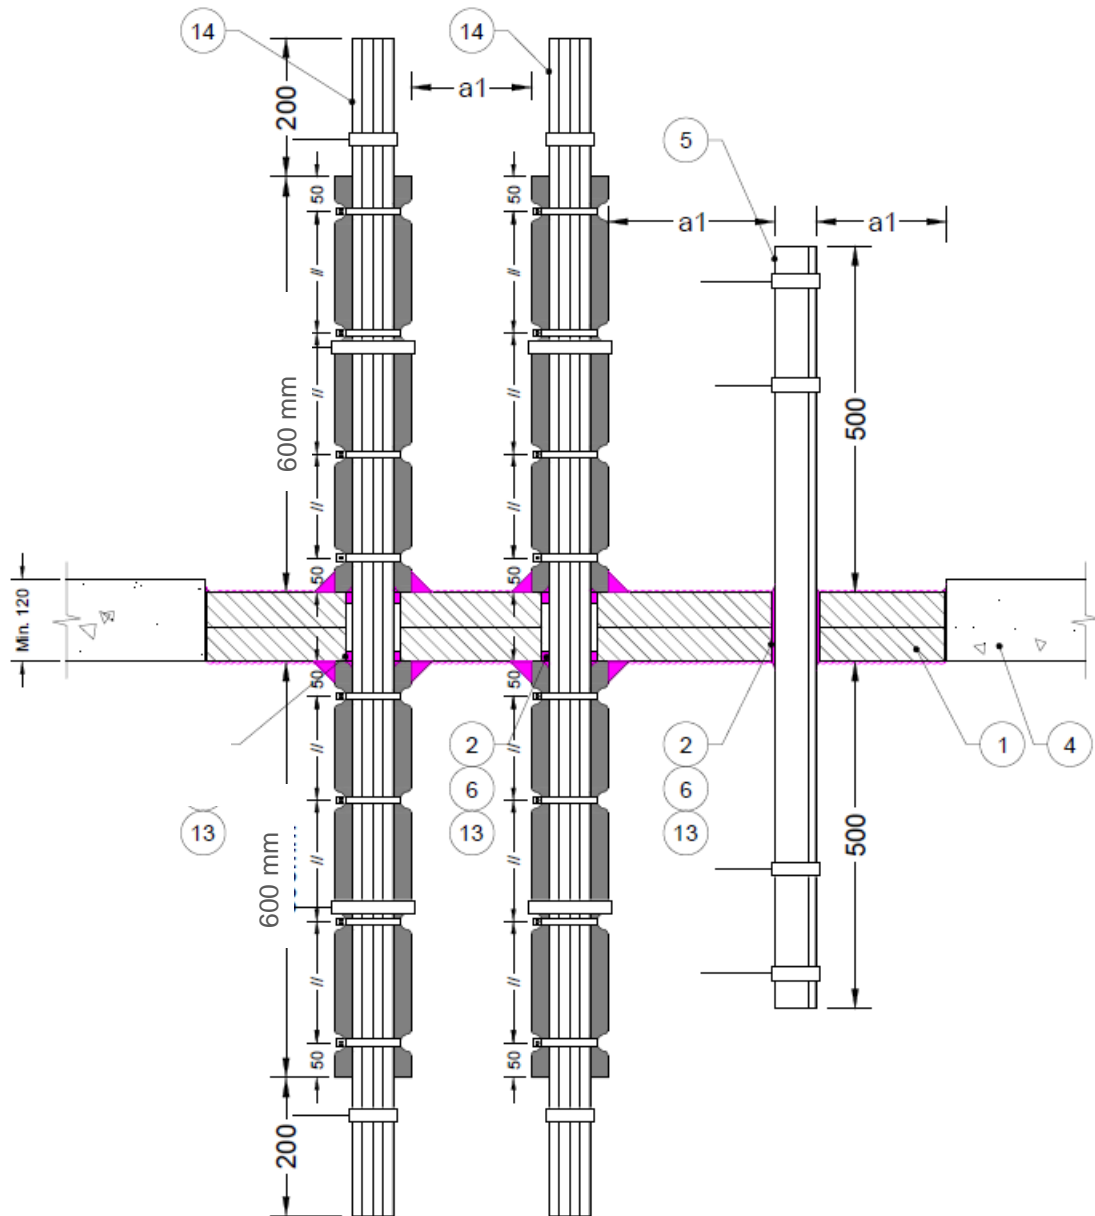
PROMASEAL® Bulkhead Batt in floors (Section D-D)
